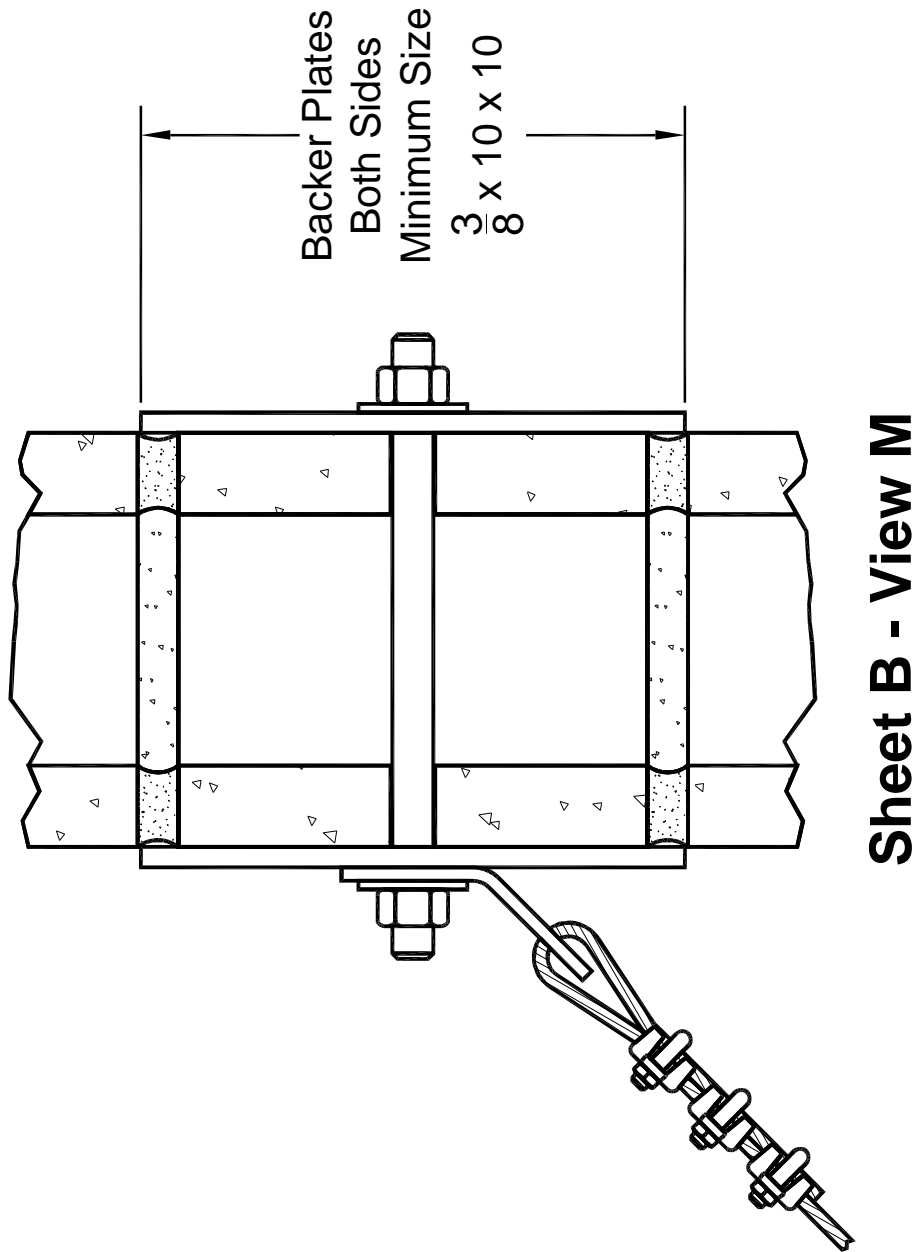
; KSCC Through Bolt Attachment to a Hollow CMU Wall
